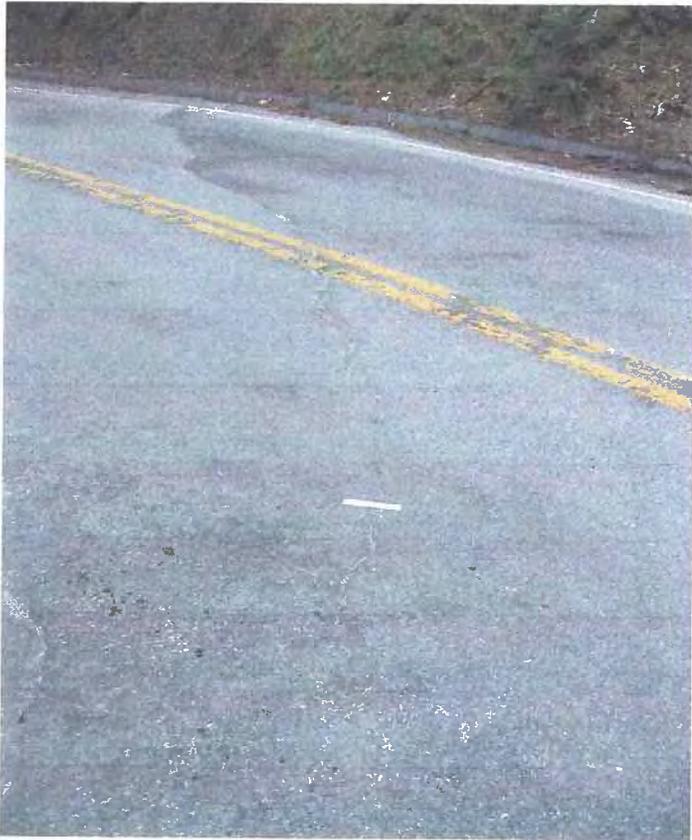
MP 2.57-2.60 - Rock slide hazard signed for this portion of road. Road constricted by bedrock outcrop on southeast side and steep drop off on northwest side (looking northeast).
